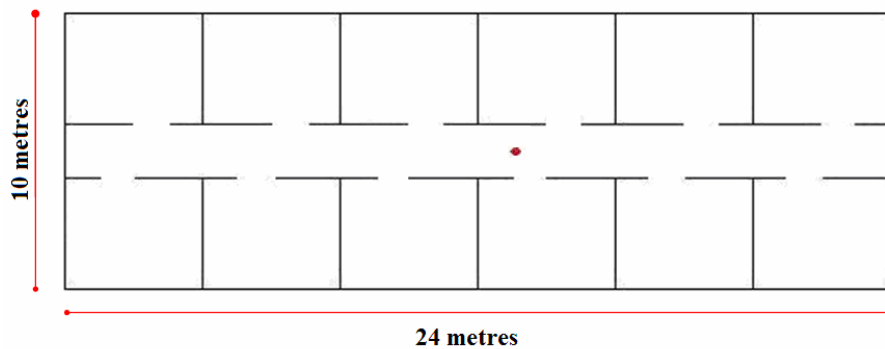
DIET planimetry, floor one, source in the first position.
